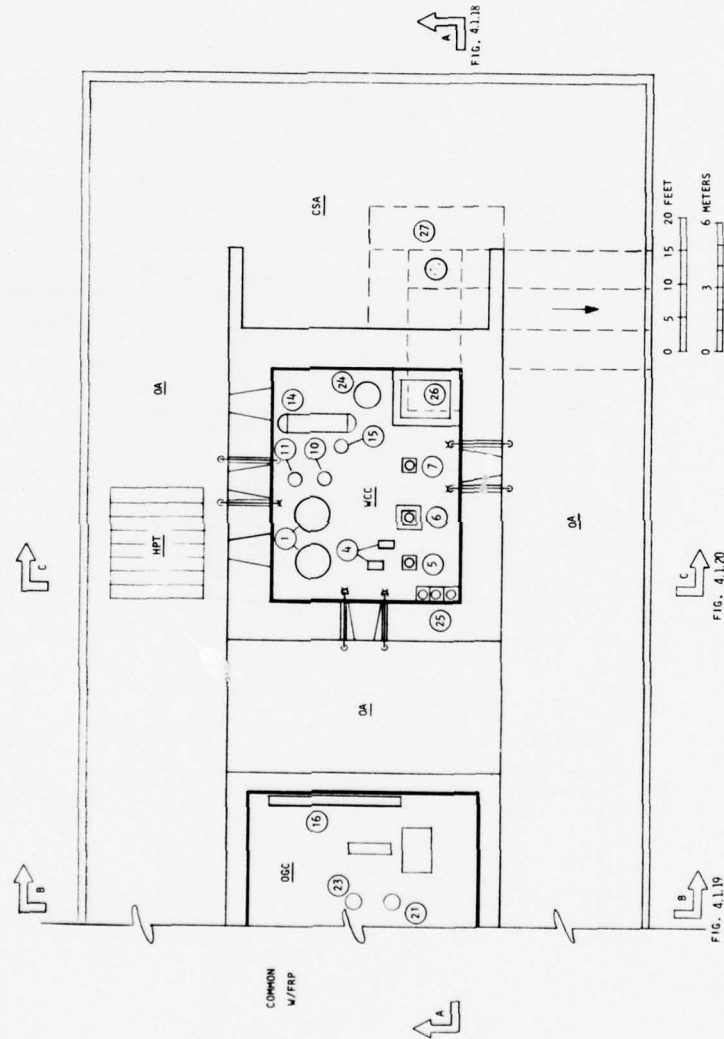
Waste Calcination Process Equipment Arrangement, Lower Plan
